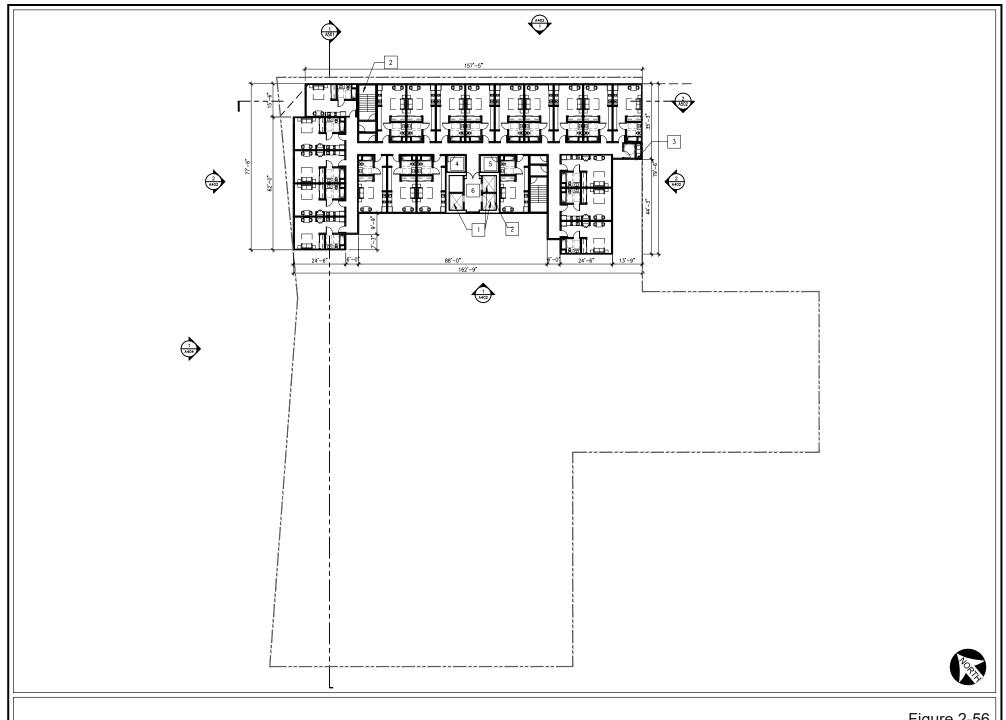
Level 9 and 14 Floor Plan - Site 2
